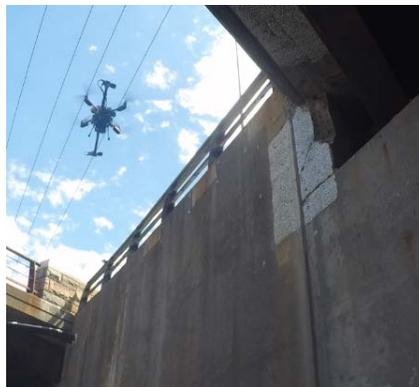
UAV inspection being performed at the expansion joint on the bridge's abutment wall on June 23, 2016.
